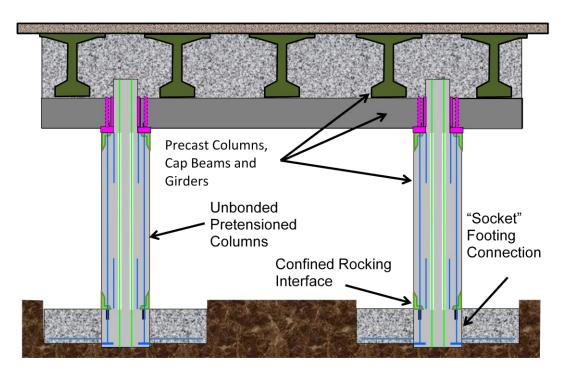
Precast, Pretensioned Rocking Column Bent Concept
